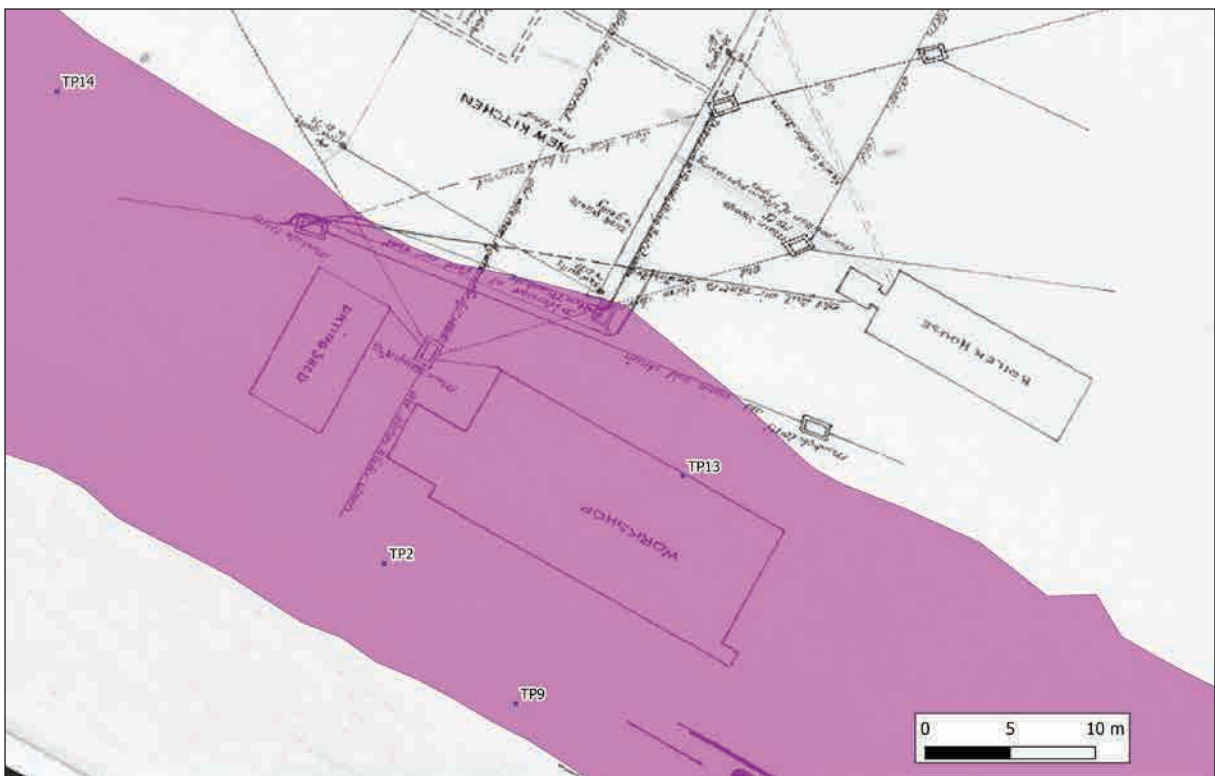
1903 plan of the alterations and additions to the hospital building showing 'workshop' and 'drying shed' within the area of proposed northern Gate 1 Road works (purple), and test pits dug during this assessment (Archives New Zealand ABZK 24411 W5433 PWD20686/1).
